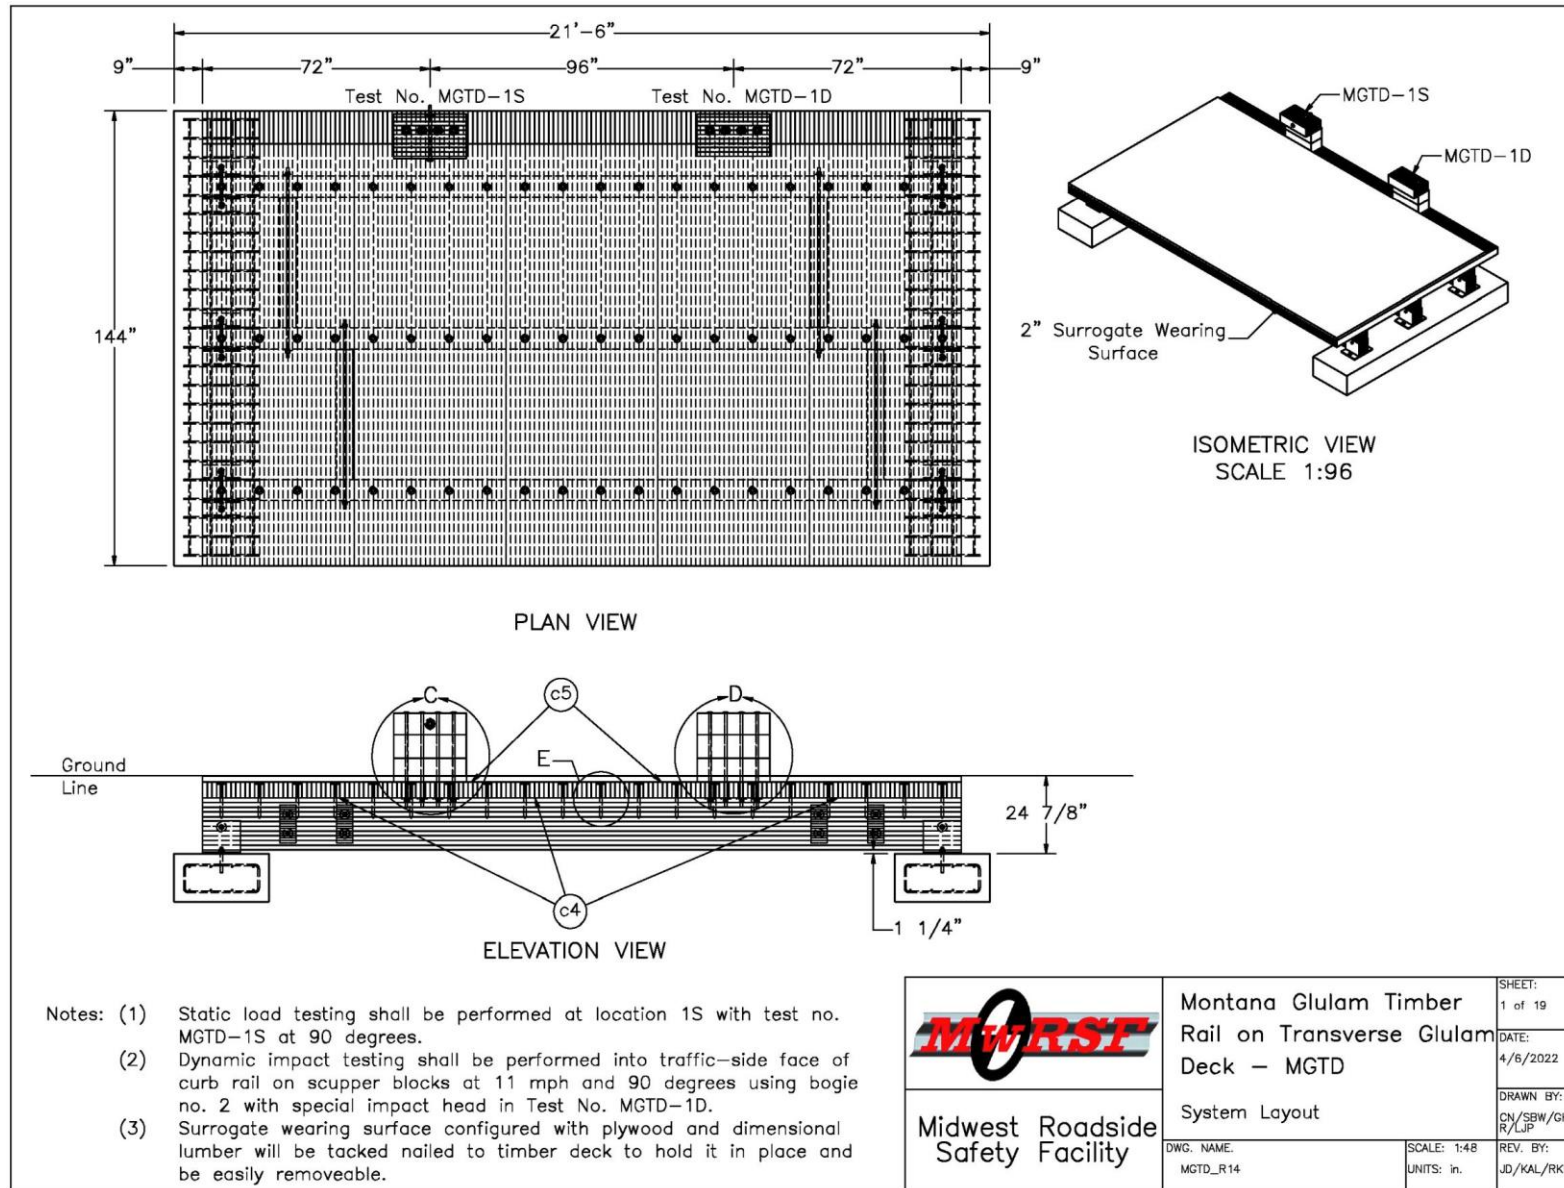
Transverse, Glulam Timber Deck and Test Nos. MGTD-1S and MGTD-1D System Layout
